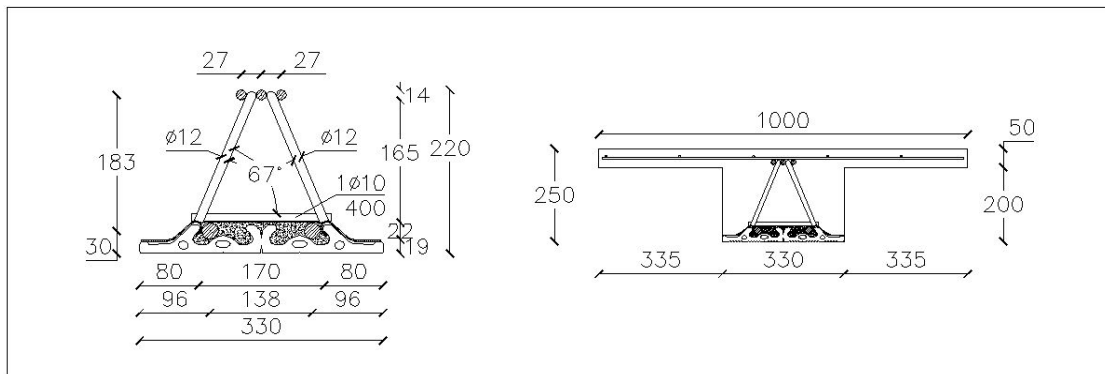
ECOTRAVE® RAFTILE® truss section of beams 103
